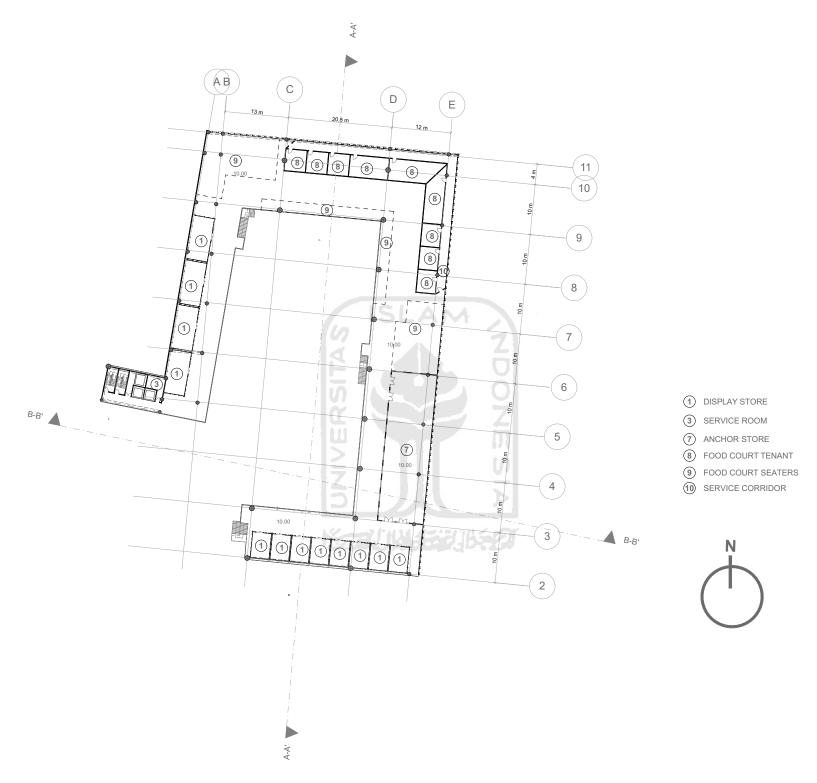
1st floor plan of the commercial center Source: Author (2021)
